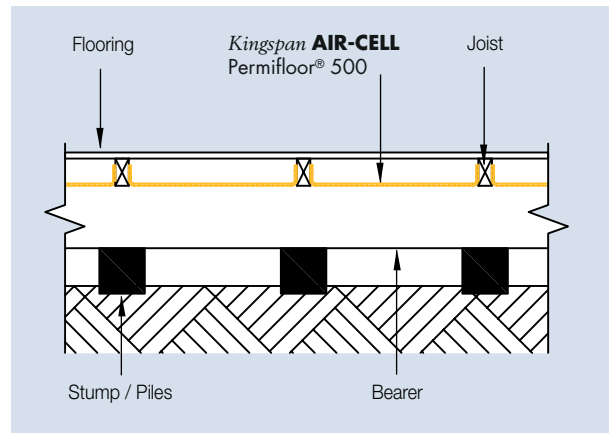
Side elevation of Kingspan AIR-CELL Permifloor® 500 in a suspended framed floor
